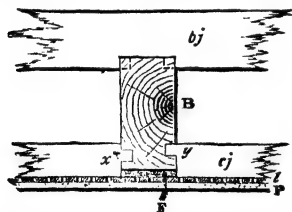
Ceiling Joists Chase-mortised into Binder.
